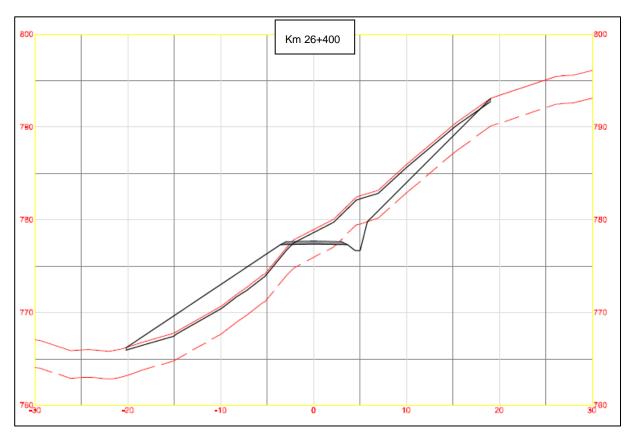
Example of Proposed Road Section that was Flagged for Field Review
